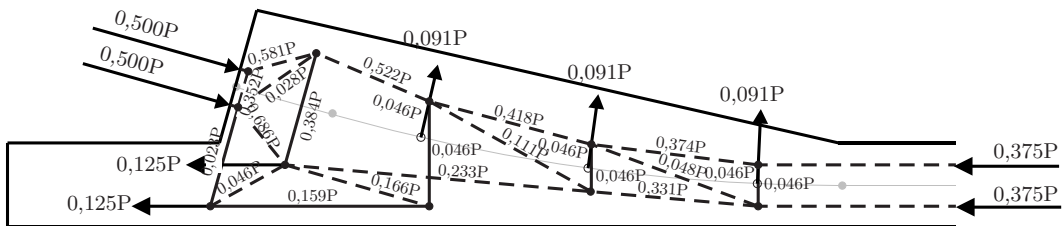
Strut and tie model - Section B-B (detail of the anchorage zone)
